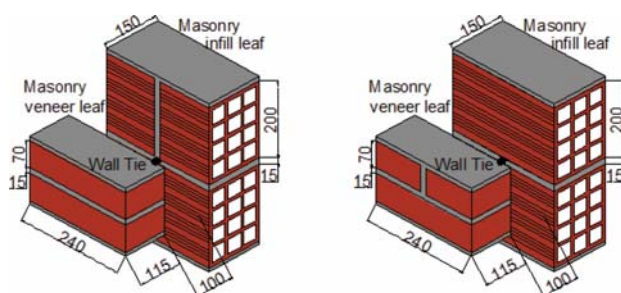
Details of construction of specimen assemblies: (a) head joint in brick veneer leaf and (b) head joint in unit masonry leaf.
